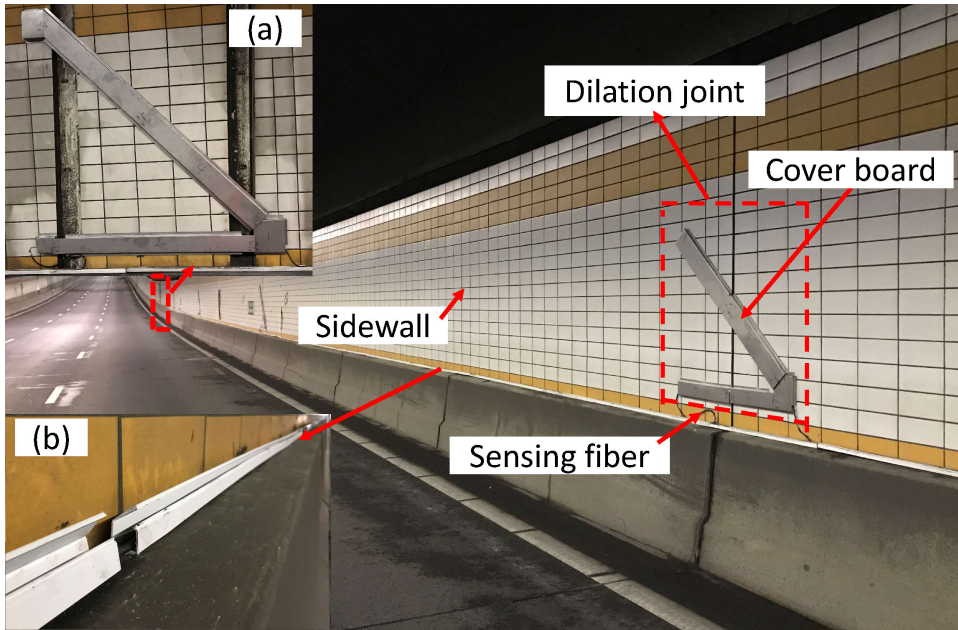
Finished fiber sensor installation in the First Heinenoordtunnel:(a) Sensor at immersion joint;(b) Loose fiber in PVC duct.
